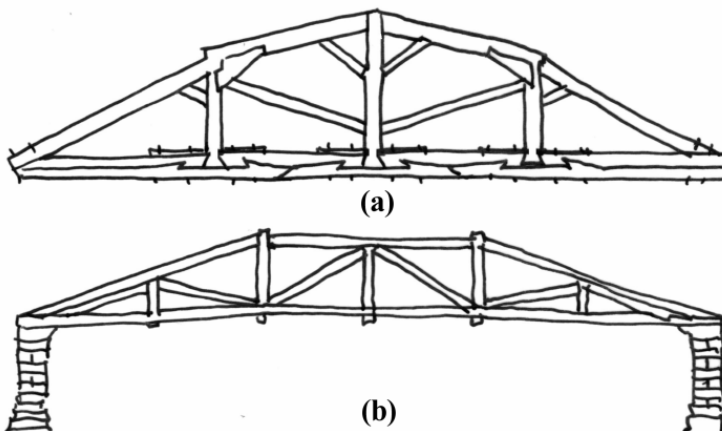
a) Diagram of truss by Wren; b) Diagram of truss by Palladio
